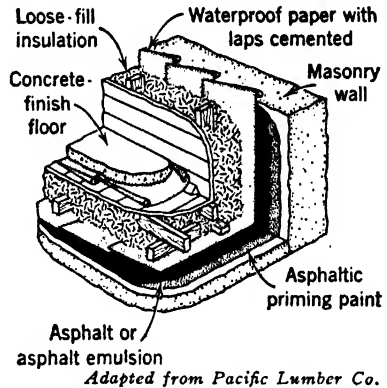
Loose-fill insulation applied to a concrete floor and masonry wall. The inner wall supporting the insulation is of wood, while a concrete wearing floor may be used.
